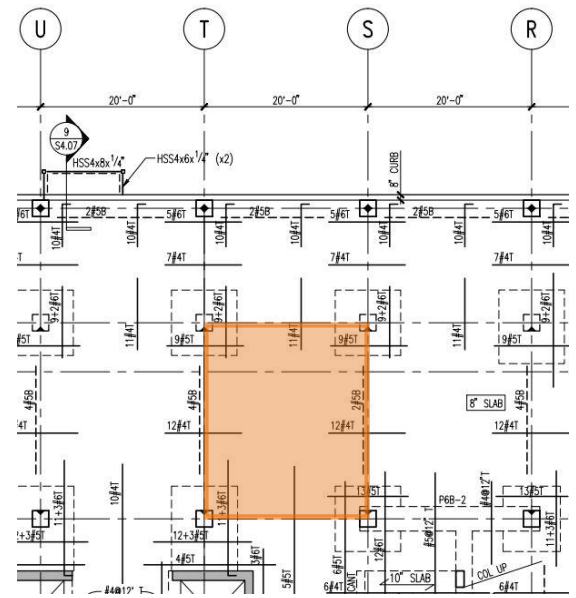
Plan of Garage Bay – by Cagley and Assoc.
